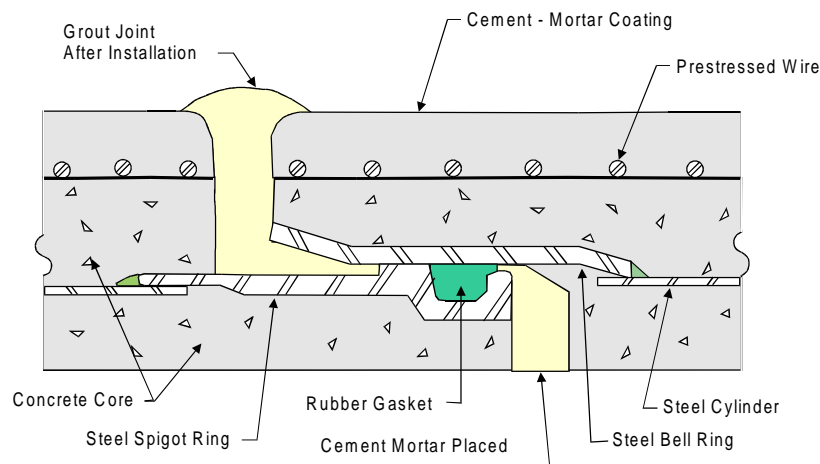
Prestressed Concrete Cylinder Pipe with the Prestressing Wire Embedded in the Exterior Cement Mortar
